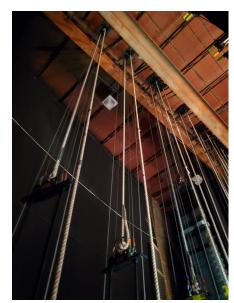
The stage left wing is mostly consumed by the rigging anchors. It is recommended that these be raised to a second level to add storage space and clear the route from the loading dock to the stage.
